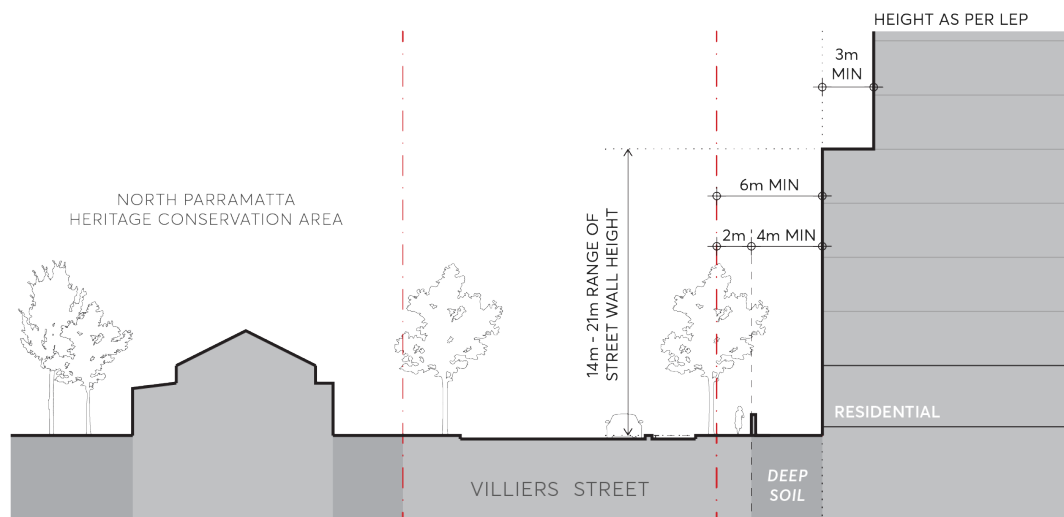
Typical Setback and Street Wall Height on Villiers Street (Section B)
